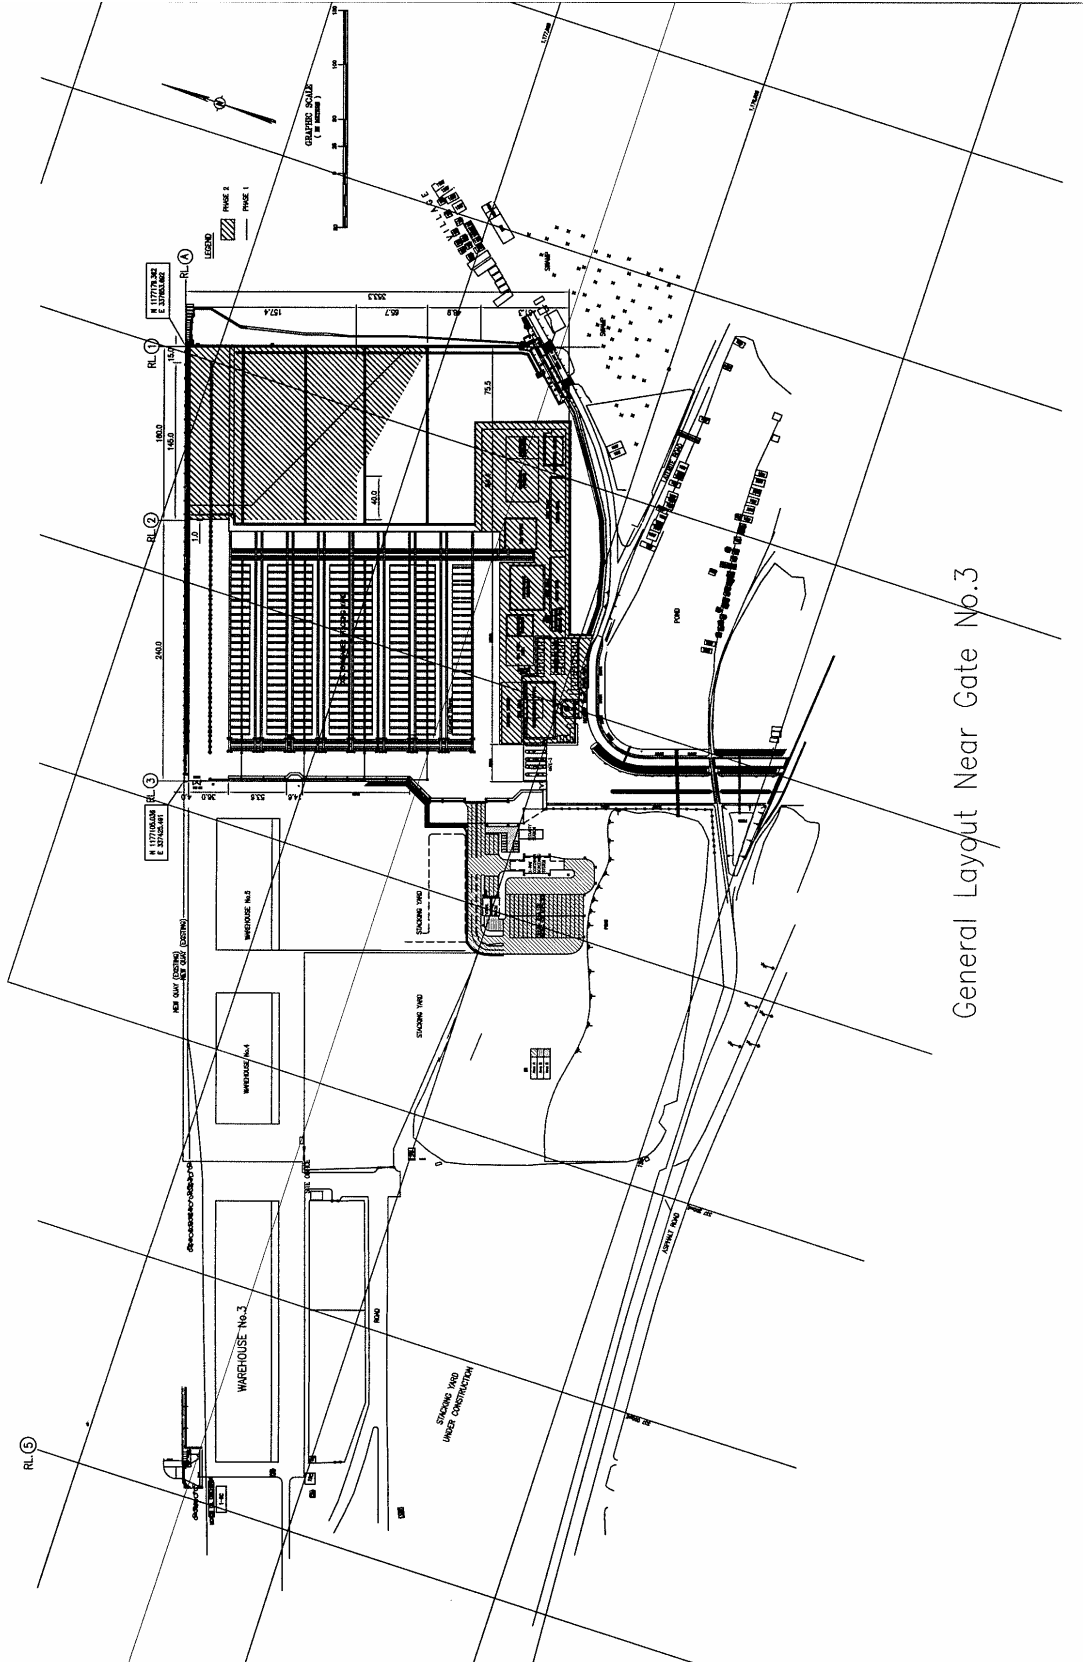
General Layout plan of Sihanoukville Port ; Security Facilities ; PAS
